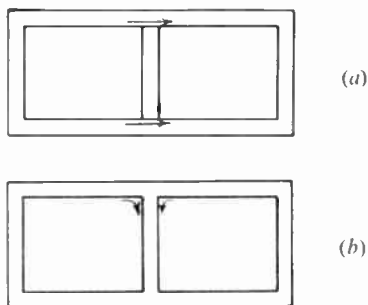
(a).—Diagram illustrating short-circuiting of cavity walls. The short-circuit can be provided by a floor, ceiling, or joining wall.
